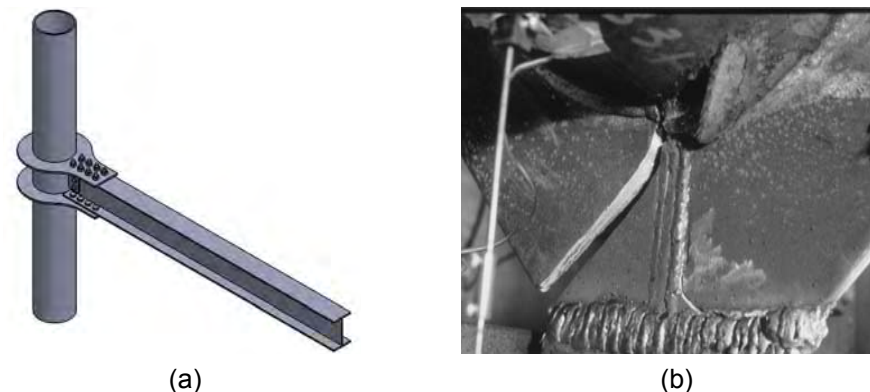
(a) Schematic drawing of external diaphragm connections (b) Fractures in diaphragm plate, weld and column of an external diaphragm connection [6]
